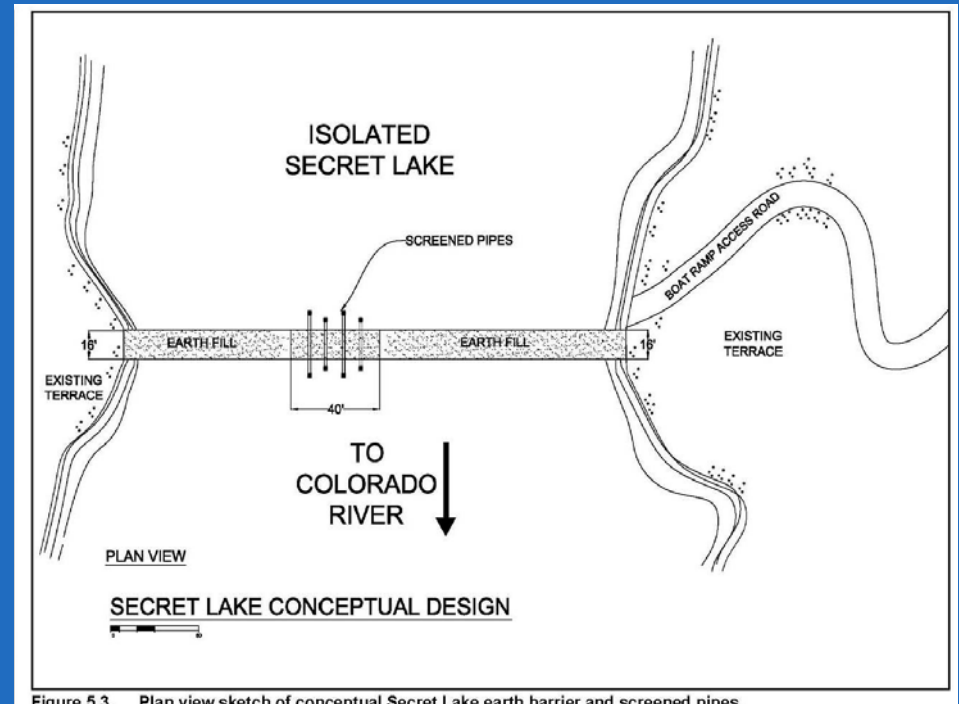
Plan view sketch of conceptual Secret Lake earth barrier and screened pipes.
